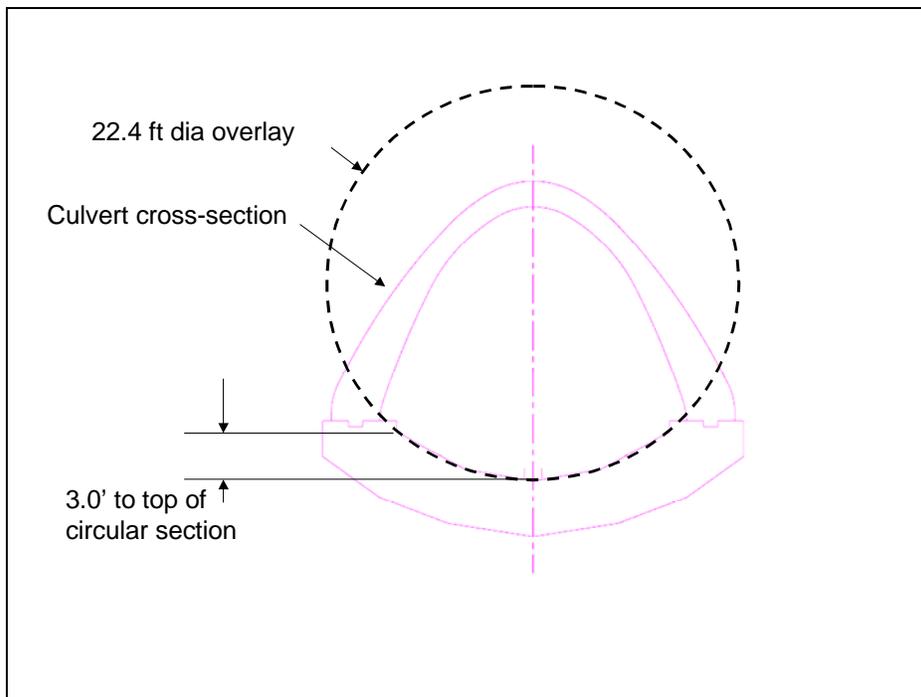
Broad Brook culvert cross-section with 22.4-foot circular culvert overlay that was used for analysis.
